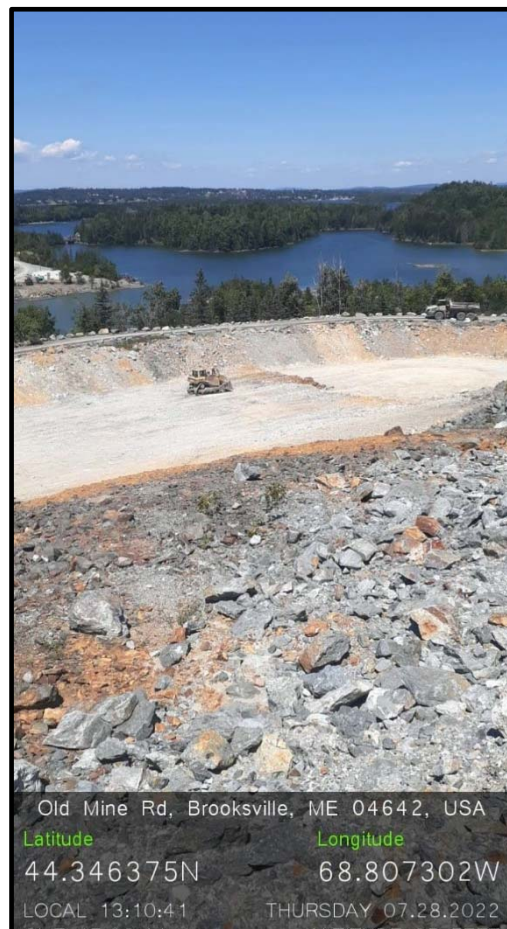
(group). View of the Stink Cove Sediment excavation area/repository.
